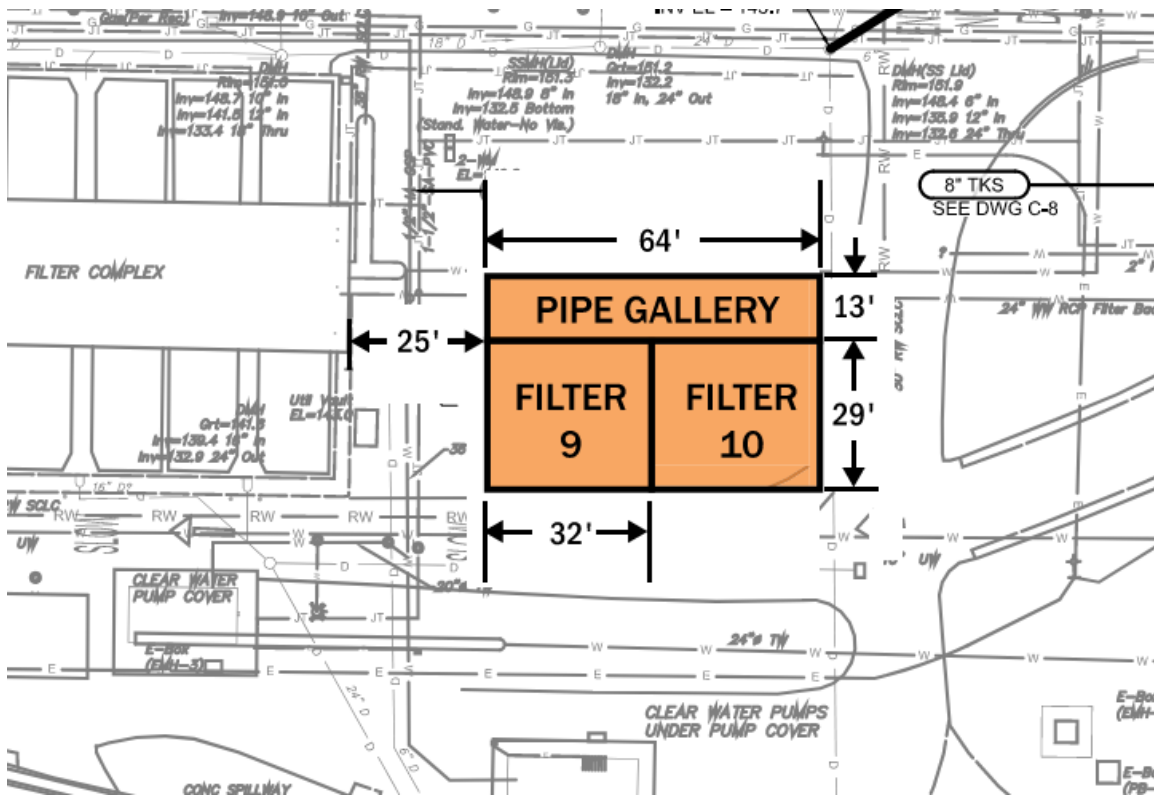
Proposed location for filters 9 and 10 overlaid on existing facilities
